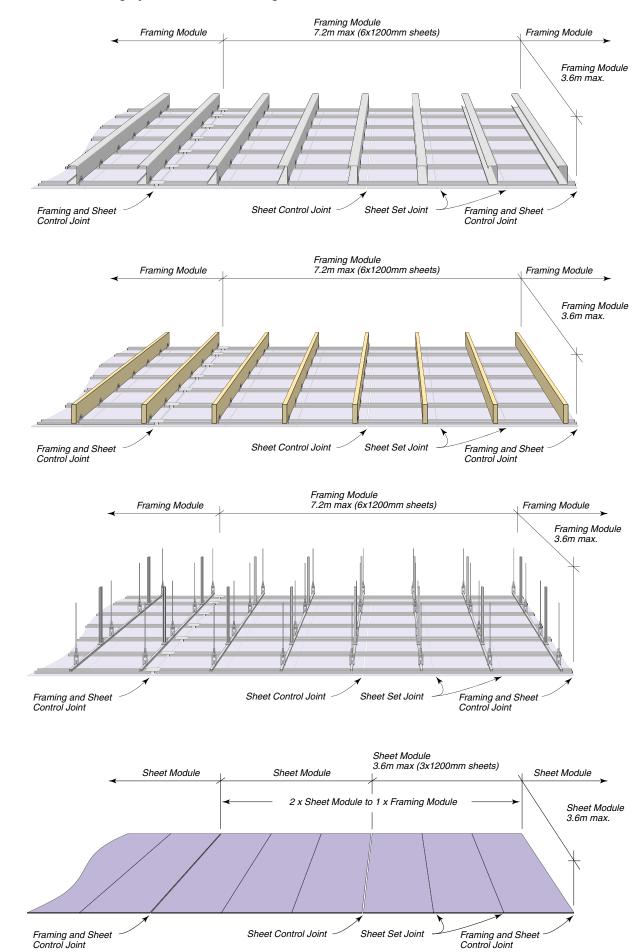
SoffitLine Ceiling System – External Ceiling with Flush-Set Joints
